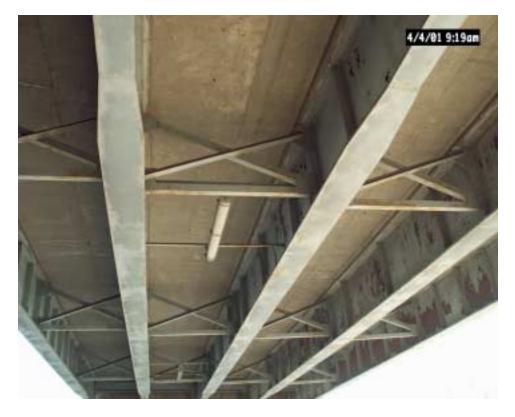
View of girders at the approach ramp at Liberty Street prior to painting.
